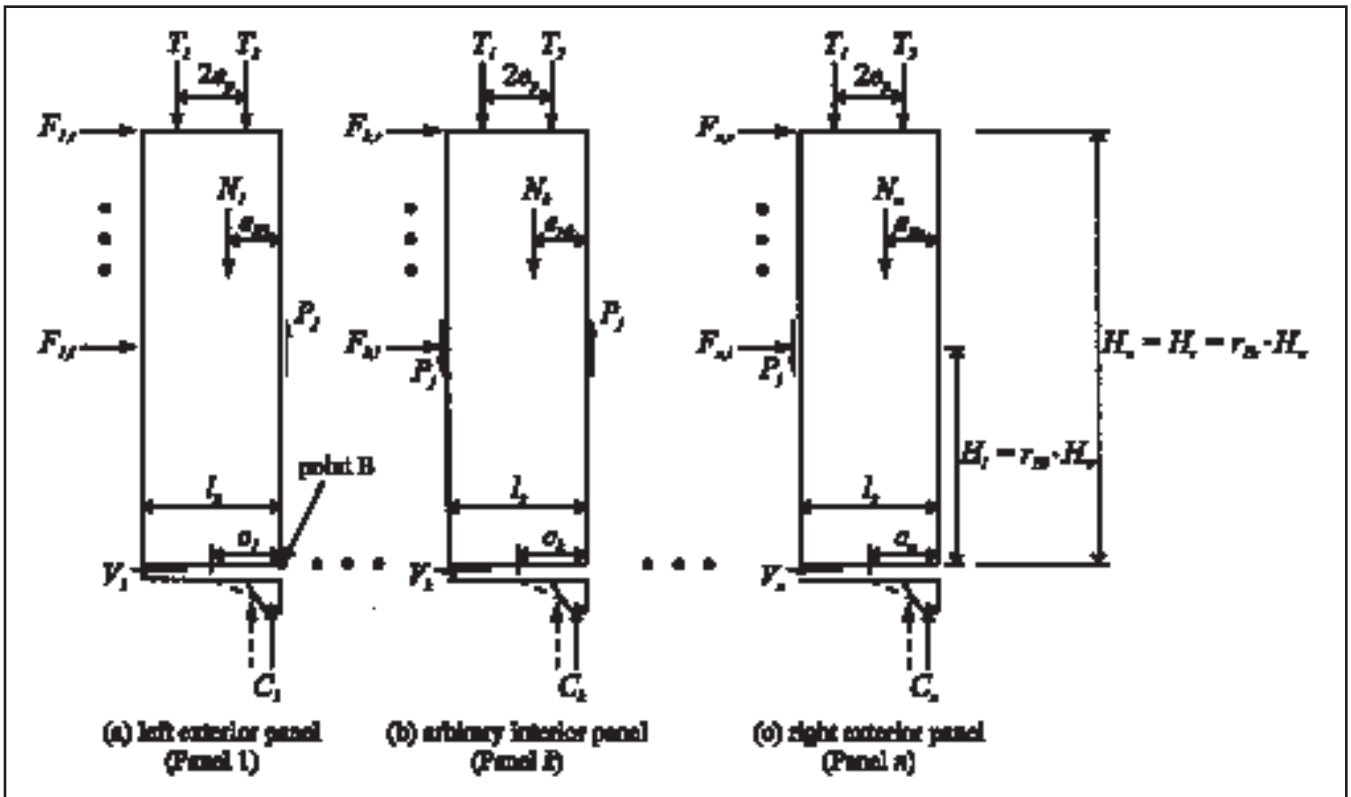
Forces on each panel of an unbonded post-tensioned precast concrete wall.
